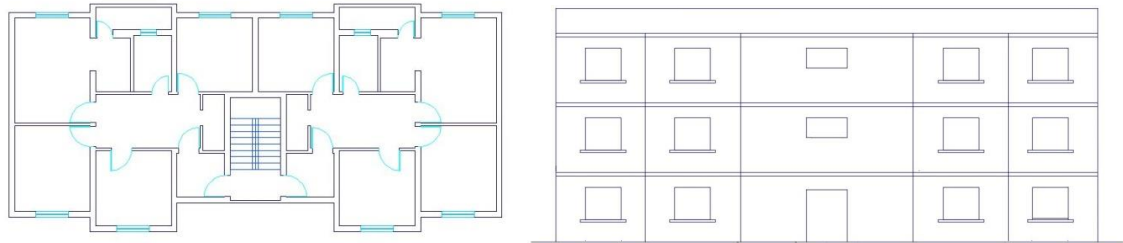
Template B1 plan and façade view [AQTN, 2018]
